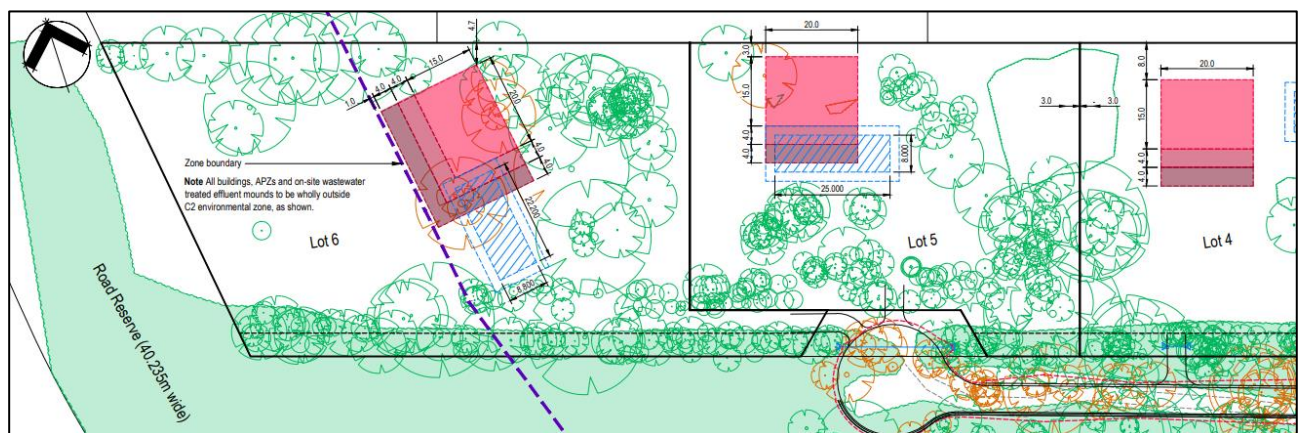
Subdivision Plan showing location of building envelope outside of C2 zone
